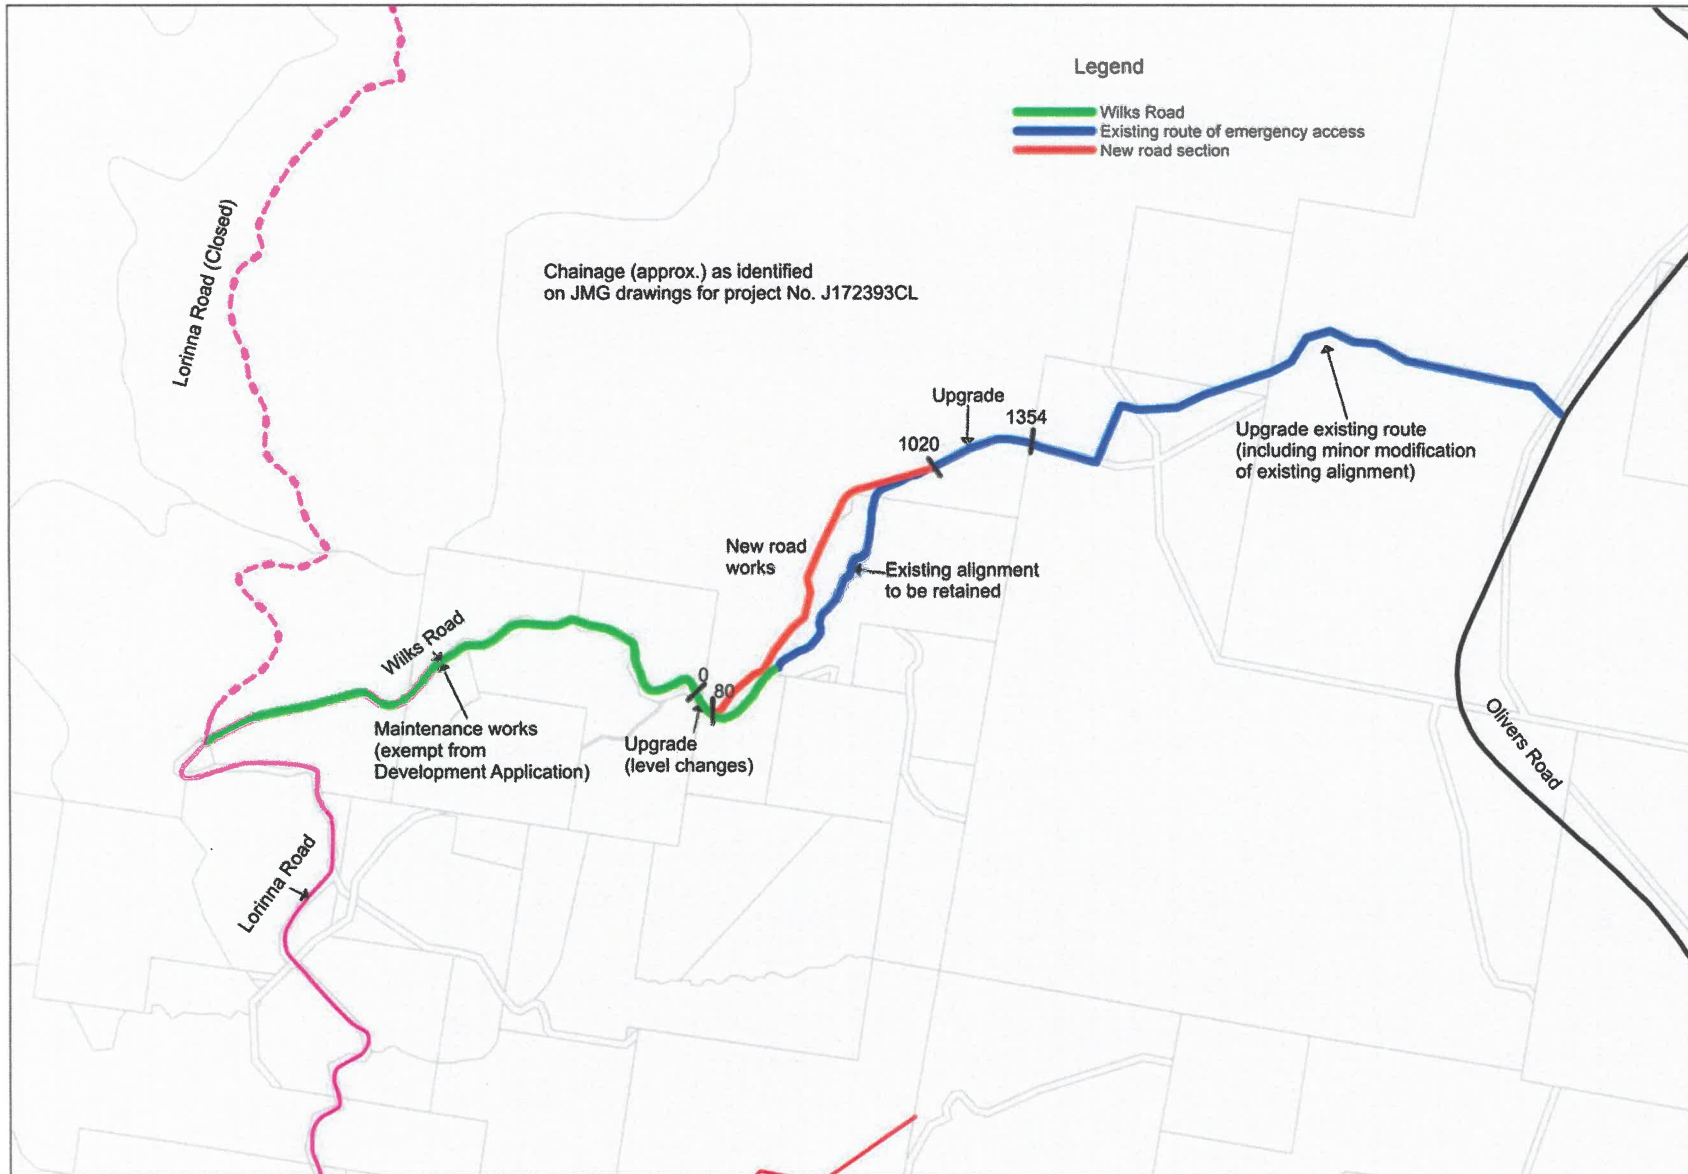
Alignment of Wilks Road, Existing Route of Emergency Access and New Road Section
